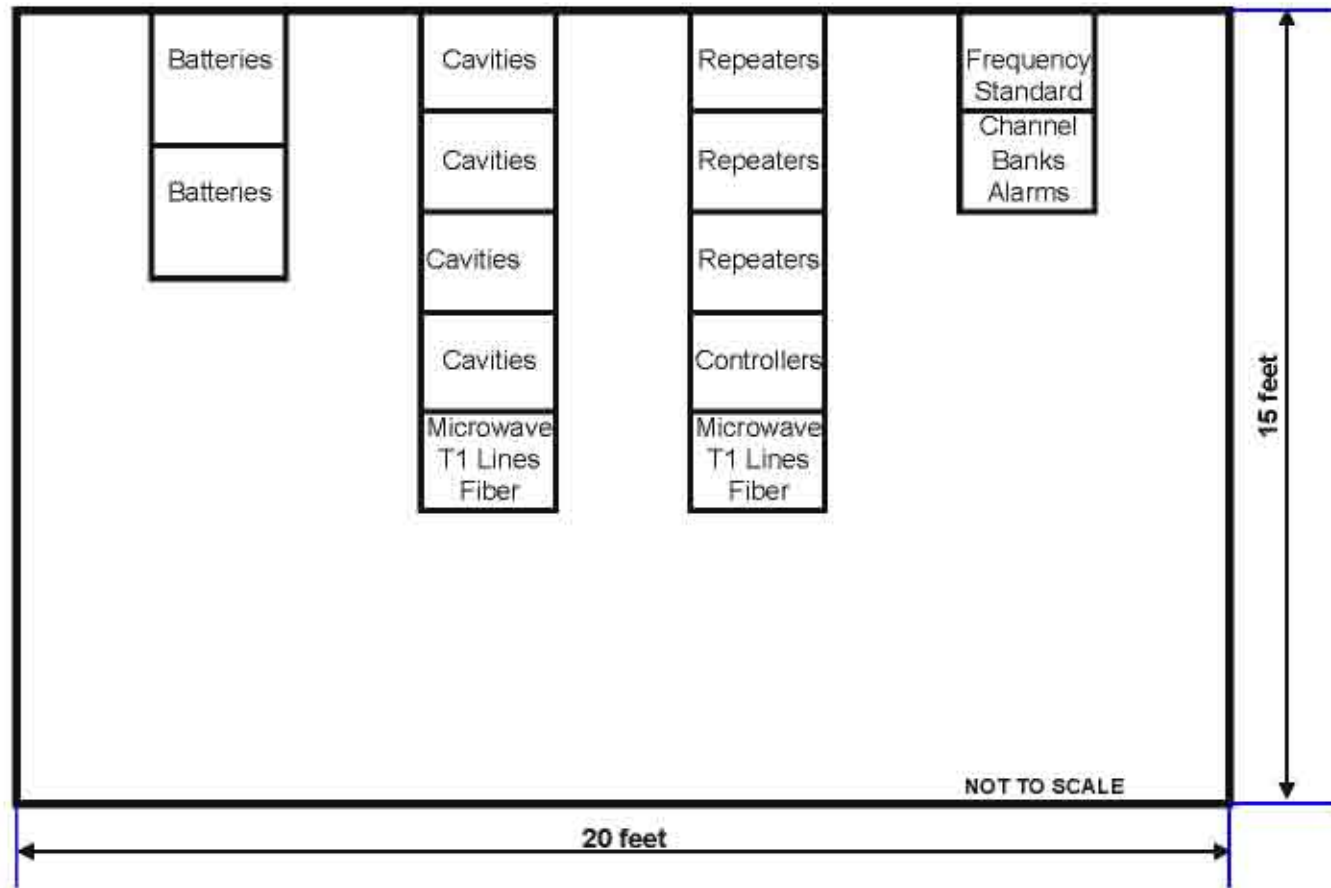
CENTRAL CONTROL SITE FLOOR LAYOUT
